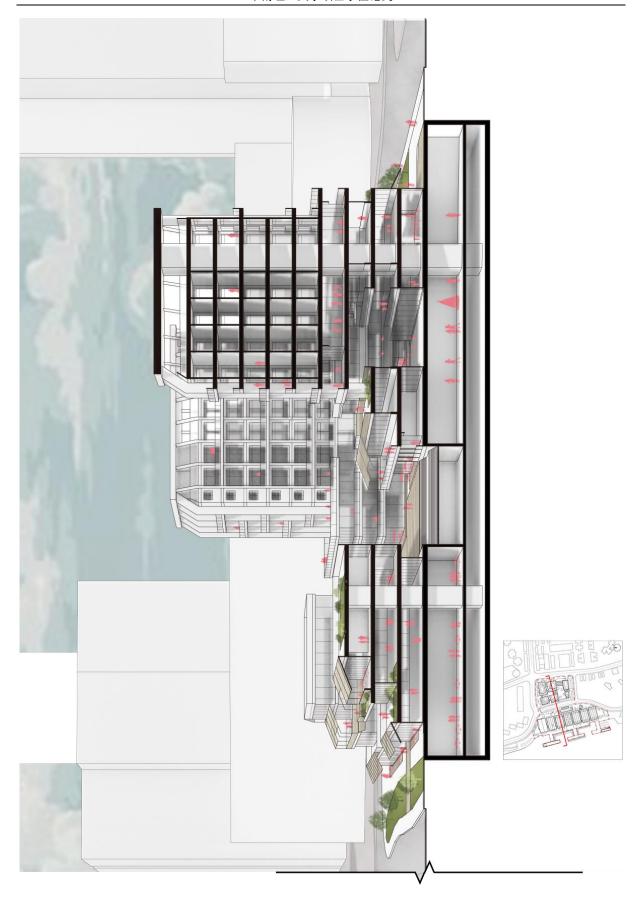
Section 1 of Taikoo Warehouse & Wharf Area (Source: by author)
